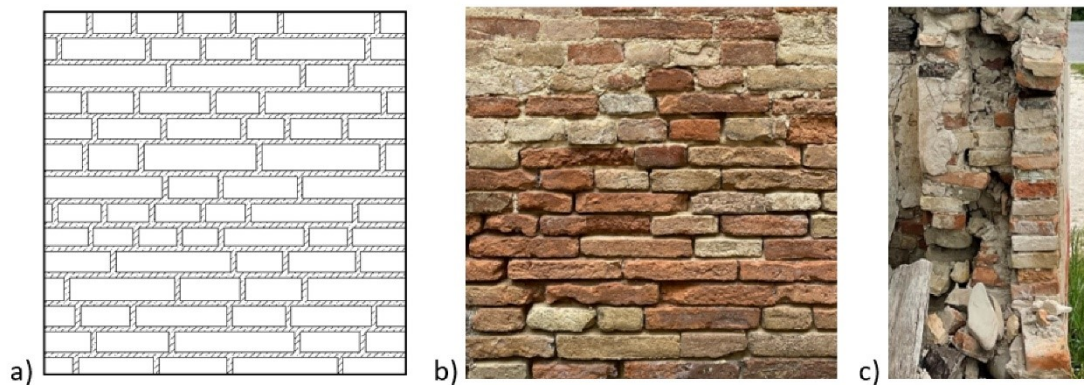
Solid clay brick and lime mortar (M7) – a) Graphic reconstruction of the wall texture type (1mx1m); b) Wall façade example, photo taken in Filottrano (AN); c) Wall section example, photo taken in Castelfidardo (AN).
